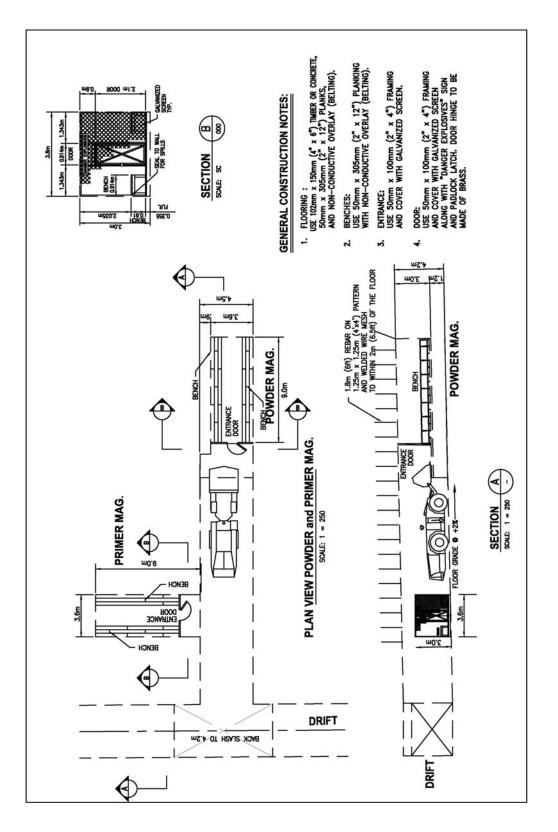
Primer and Explosive Magazines – Plan and Section Views
